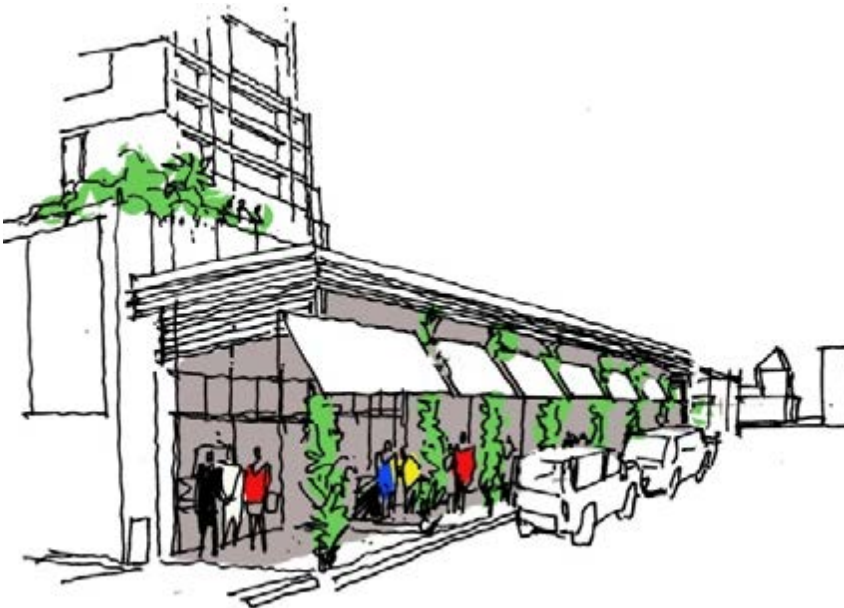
f – Street canopy (filtered light and shade)
